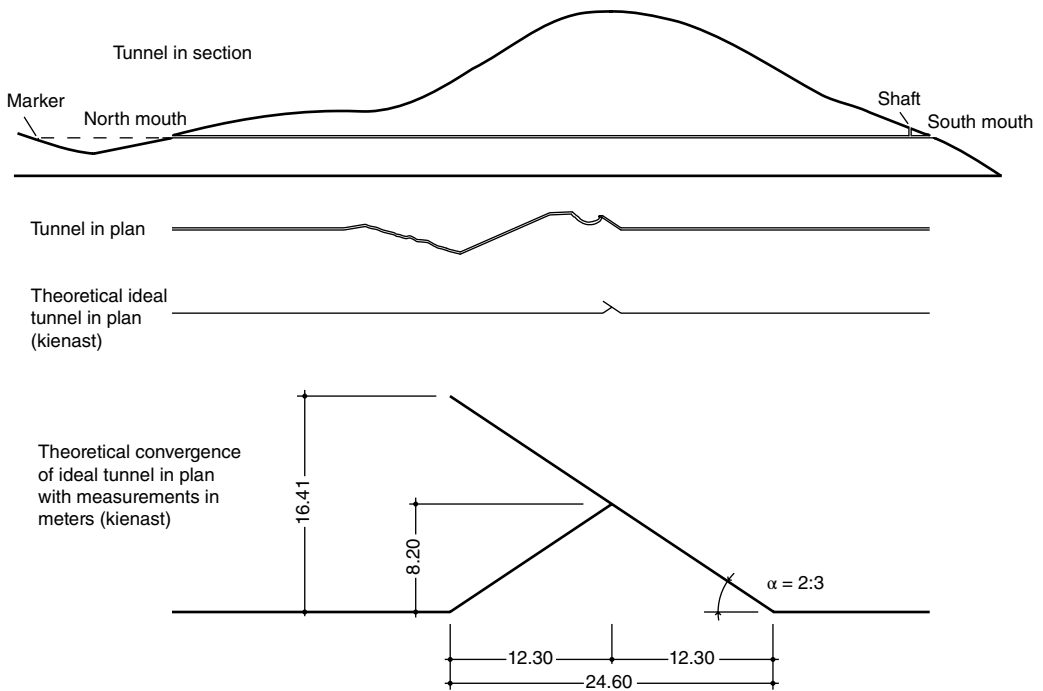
Tunnel of Eupalinos, Samos, showing tunnel in section, plan, and theoretical ideal plan with a detail of this ideal plan's convergence, according to Kienast. *Source:* J. Senseney, adapted from Kienast 1995: fig. 46a, foldout plans 3a and 3b.
